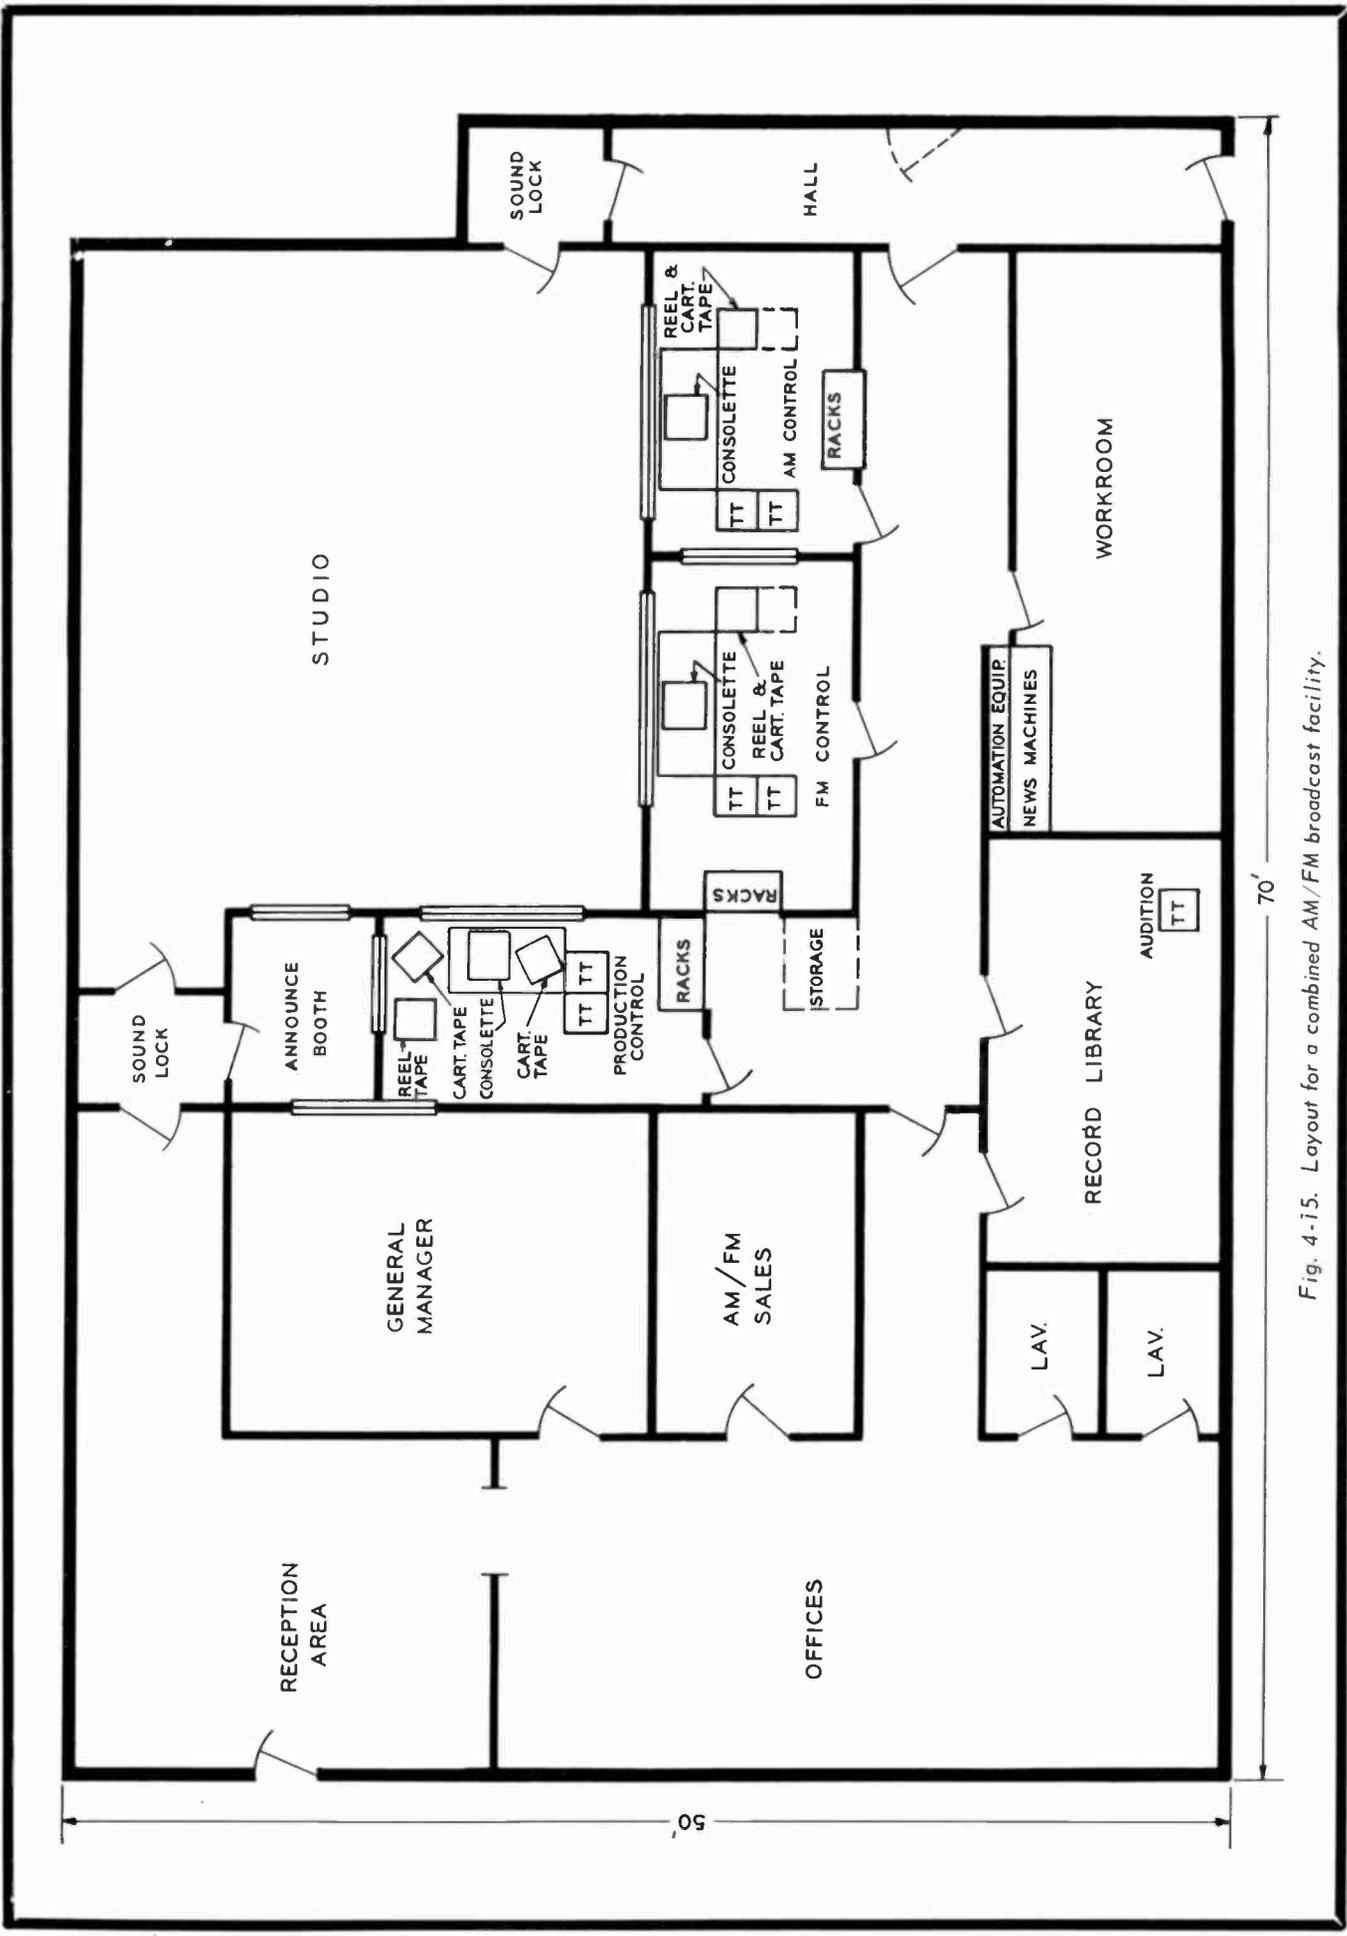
i5. Layout for a combined AM/FM broadcast facility.
